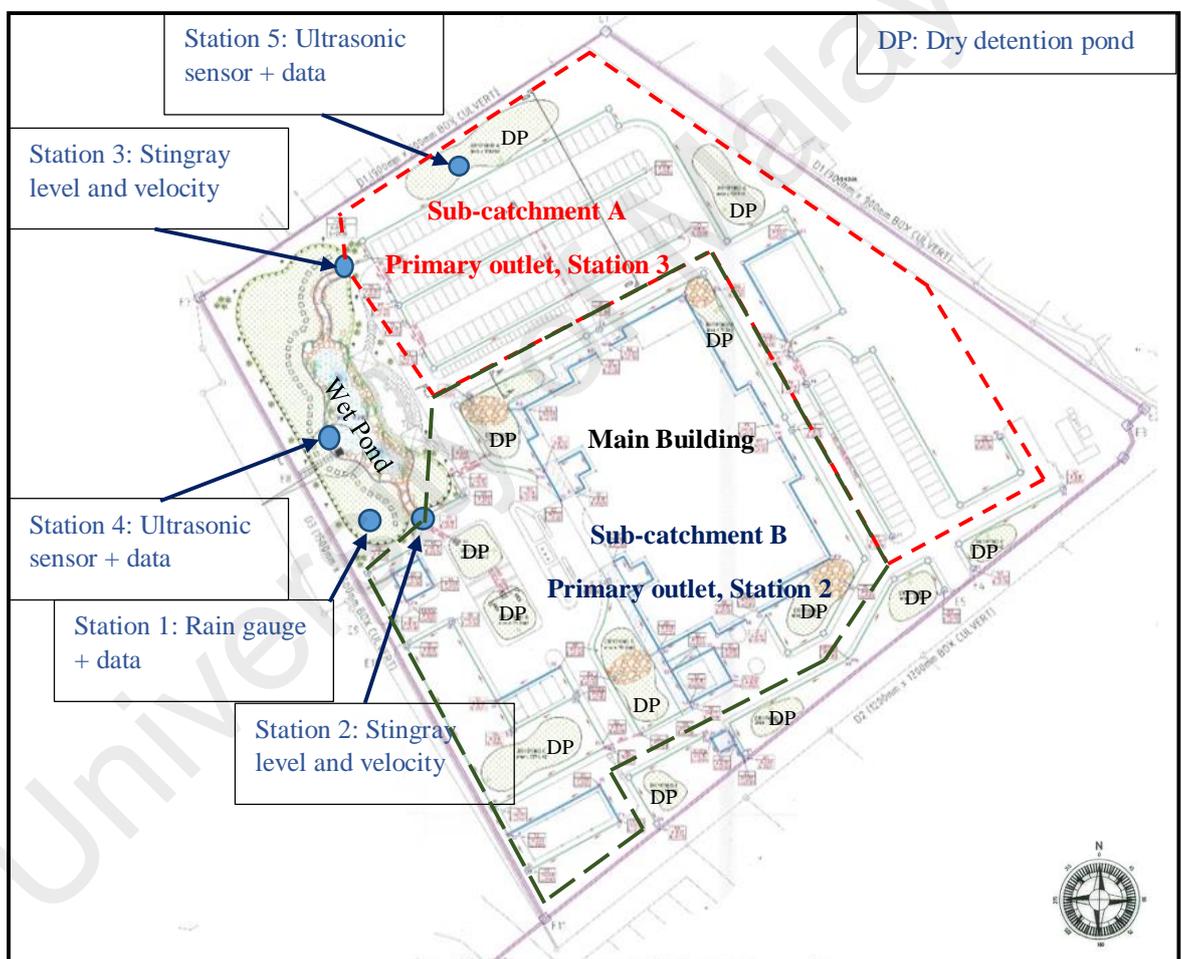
Plan view of study area and location of rainfall-runoff monitoring stations
